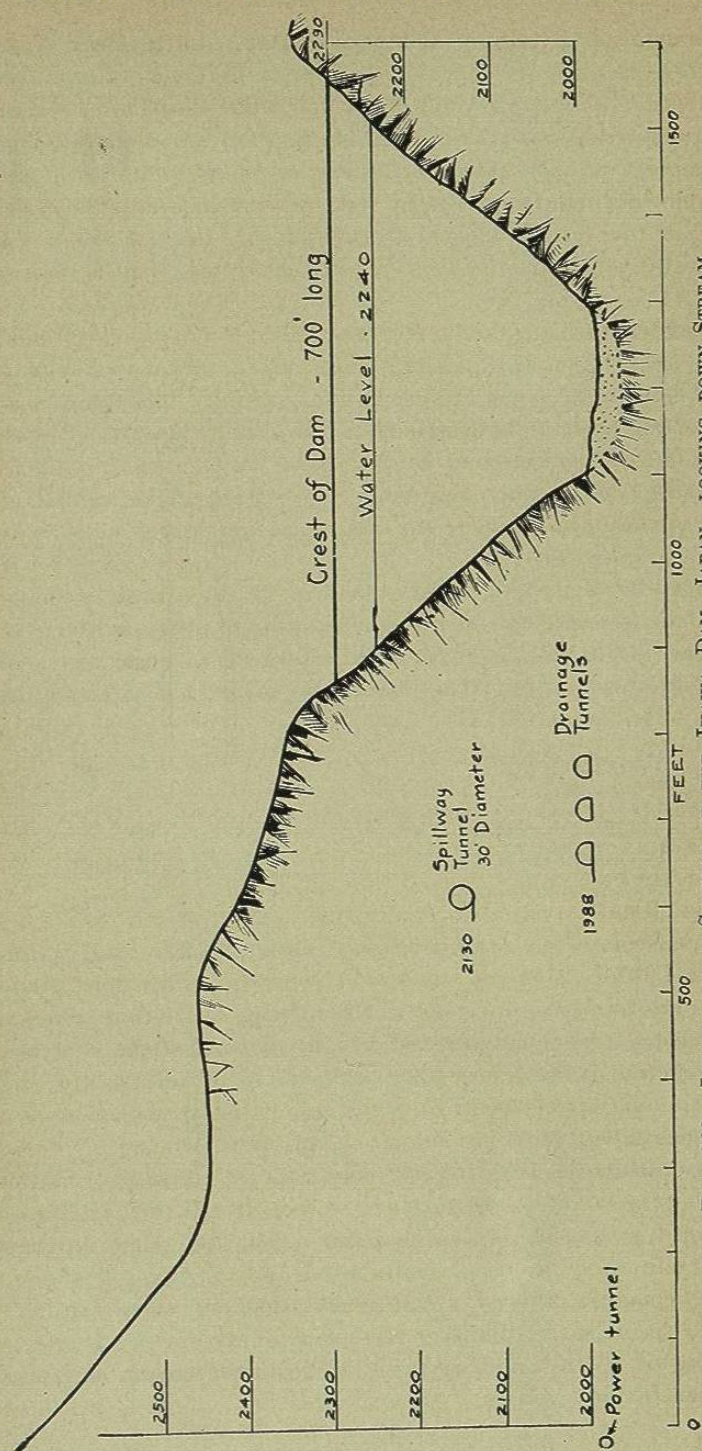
LONGITUDINAL SECTION OF THE IKAWA DAM, JAPAN, LOOKING DOWN STREAM
